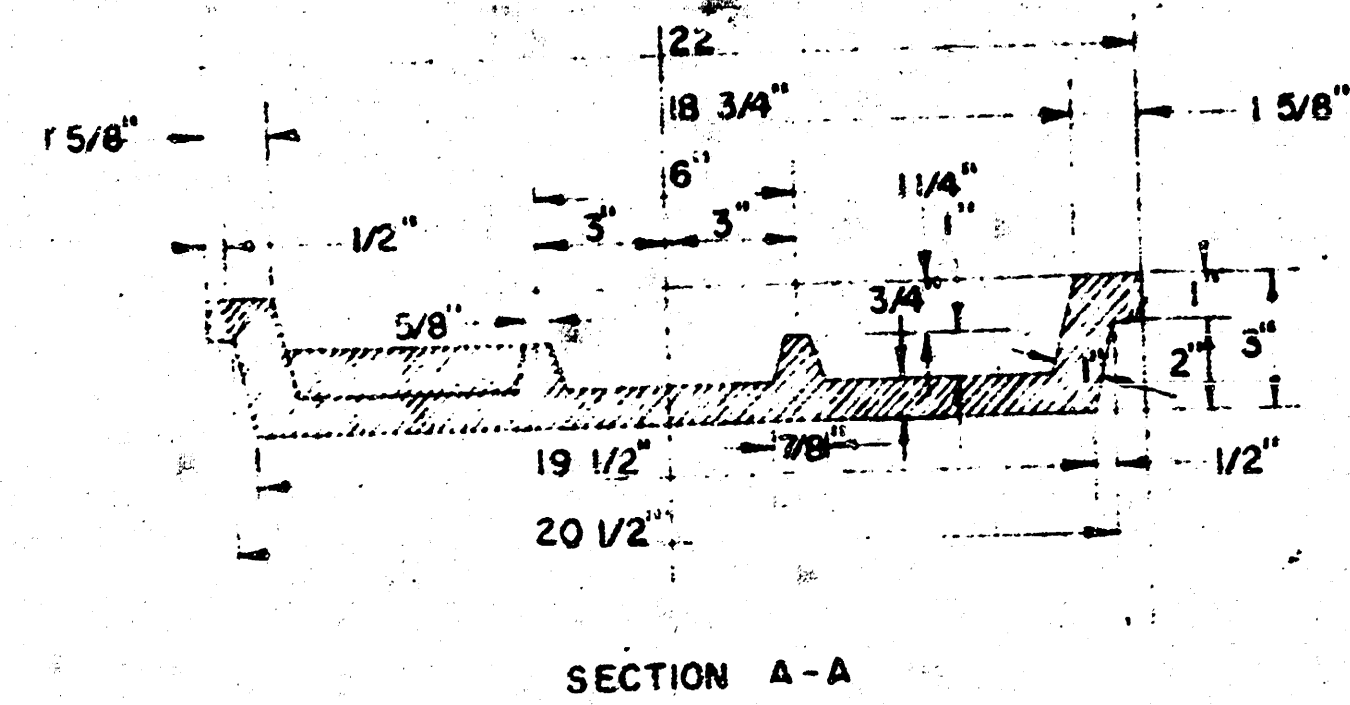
DETAIL OF IMPROVED BEDDING FOR P.V.C. PIPE
